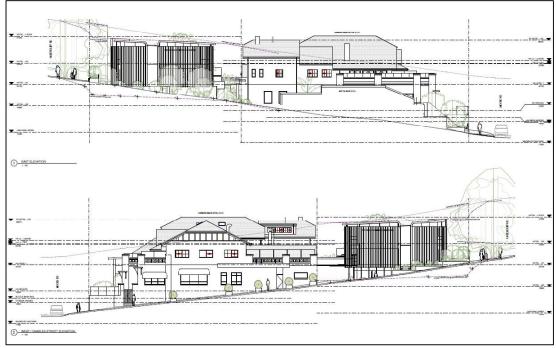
Excerpt from architectural plans; Indicative east and west elevations.
